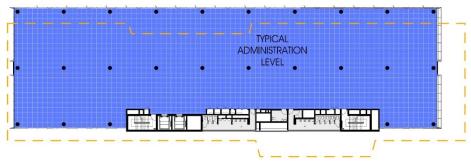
Proposed Building A floorplate with SSDA approved outline in orange
